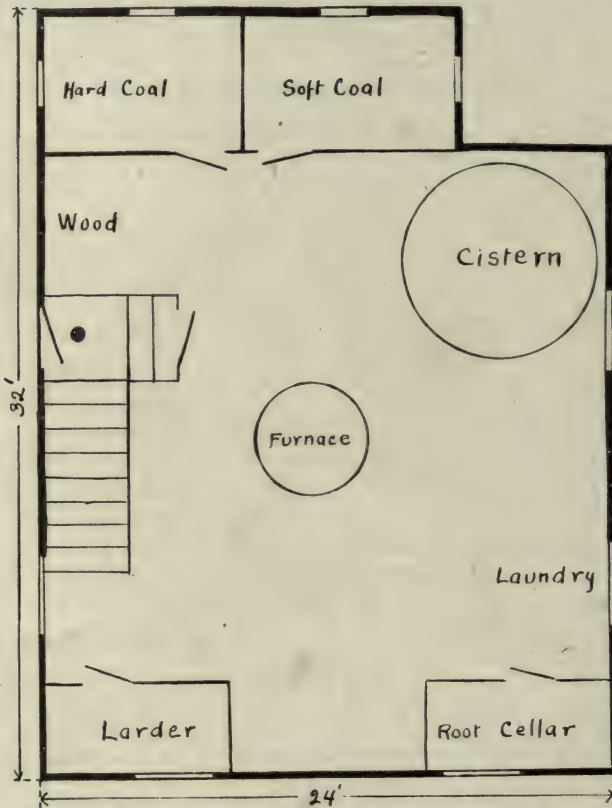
BASEMENT PLAN WHICH SHOULD BE AN ADJUNCT TO THE KITCHEN
